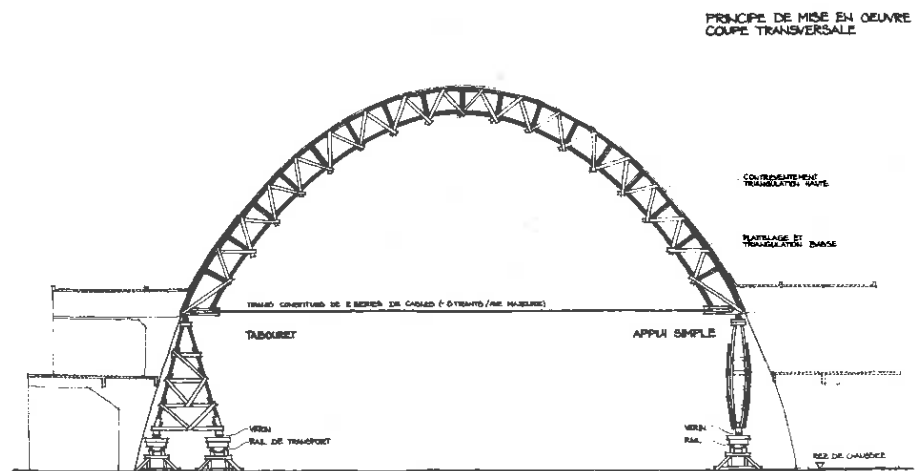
Reims Marketplace—Graphic reconstruction of vault formwork after construction photographs [9].
